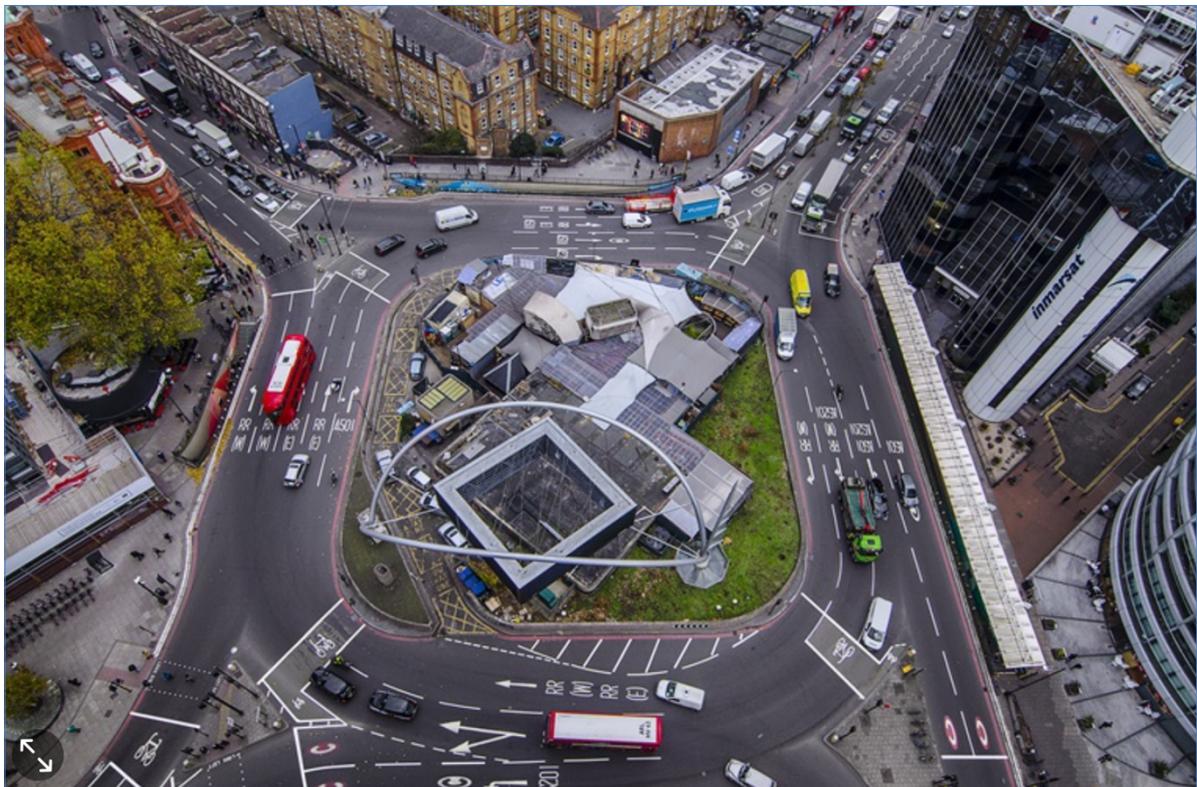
View of Old Street roundabout looking northeast towards Hackney.
